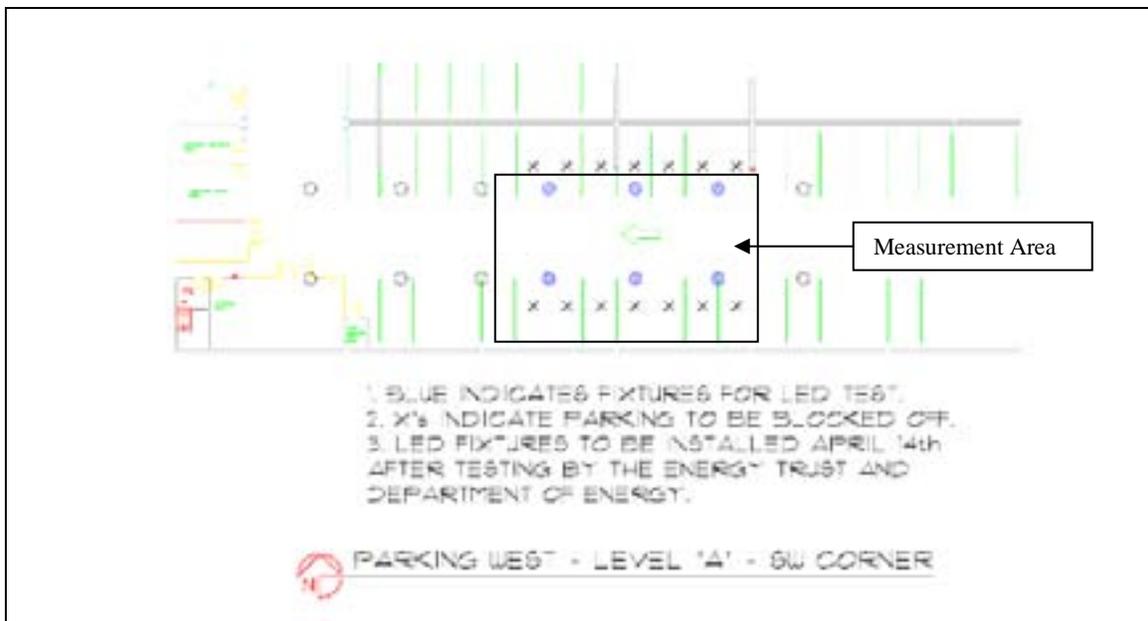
Drawing of Installation Area on Level A (not to scale)
